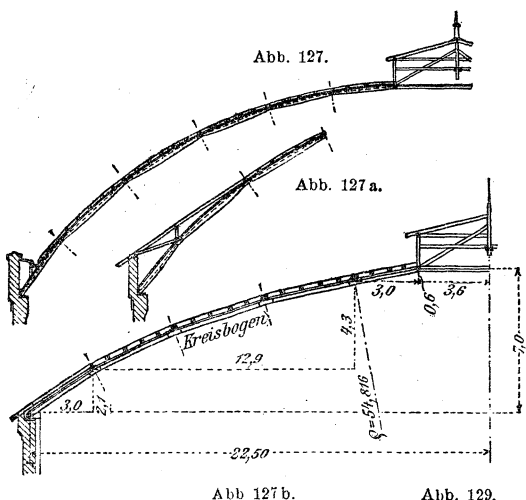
Detail of a joint with dimensions 12.9, 3.0, 0.6, 3.0, 7.0, and 22.50.
